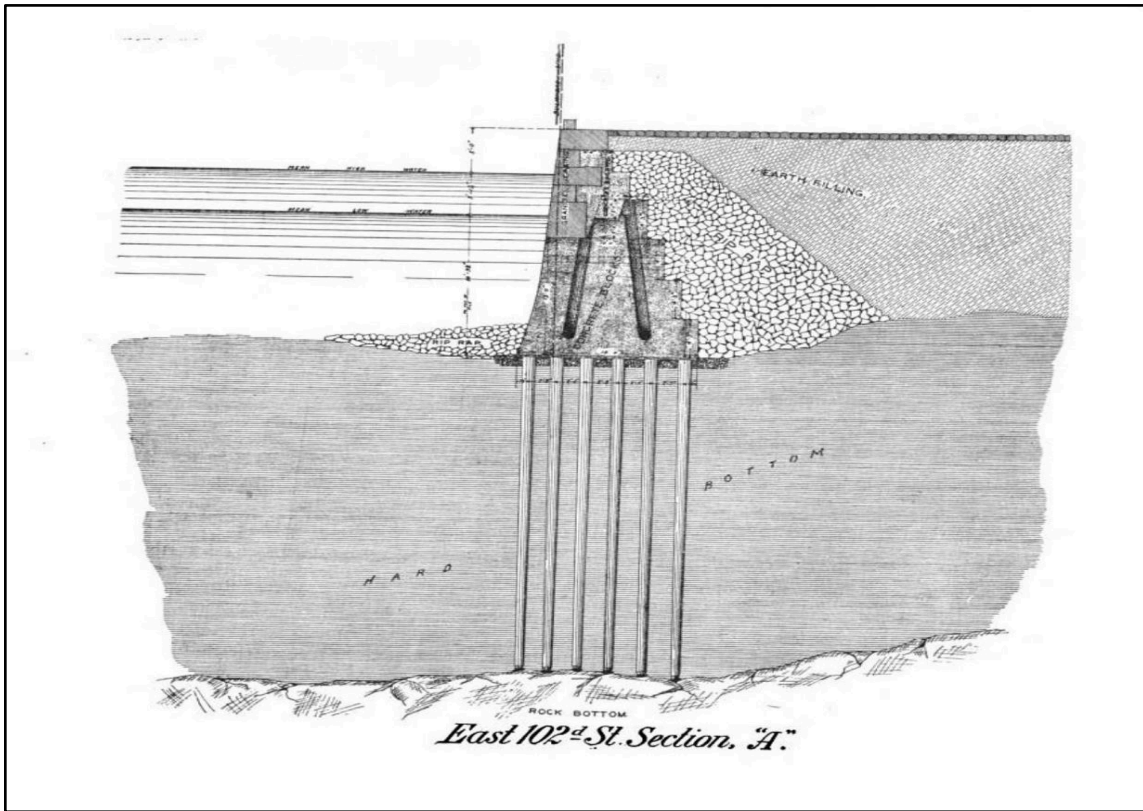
A granite-faced concrete block wall on piles introduced at 102nd Street and the Harlem River in 1891. This version of Greene’s 1876 type bulkhead, intended for hard bottom conditions, was the first known gravity wall bulkhead in the archaeological APE (Hoag 1906:Plate XXXIX). The same illustration is found in Carleton Greene’s *Wharves and Piers* (1917:65) but without a date.
